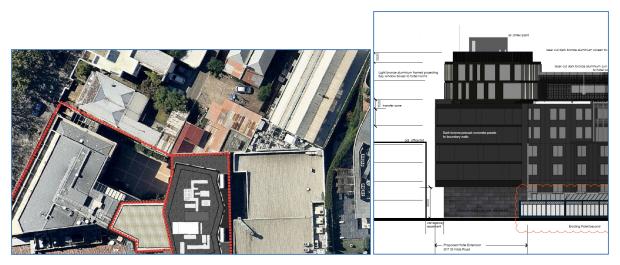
extract of the endorsed site plan and east elevation plans of TP-2011-404/D (Source: Council)
